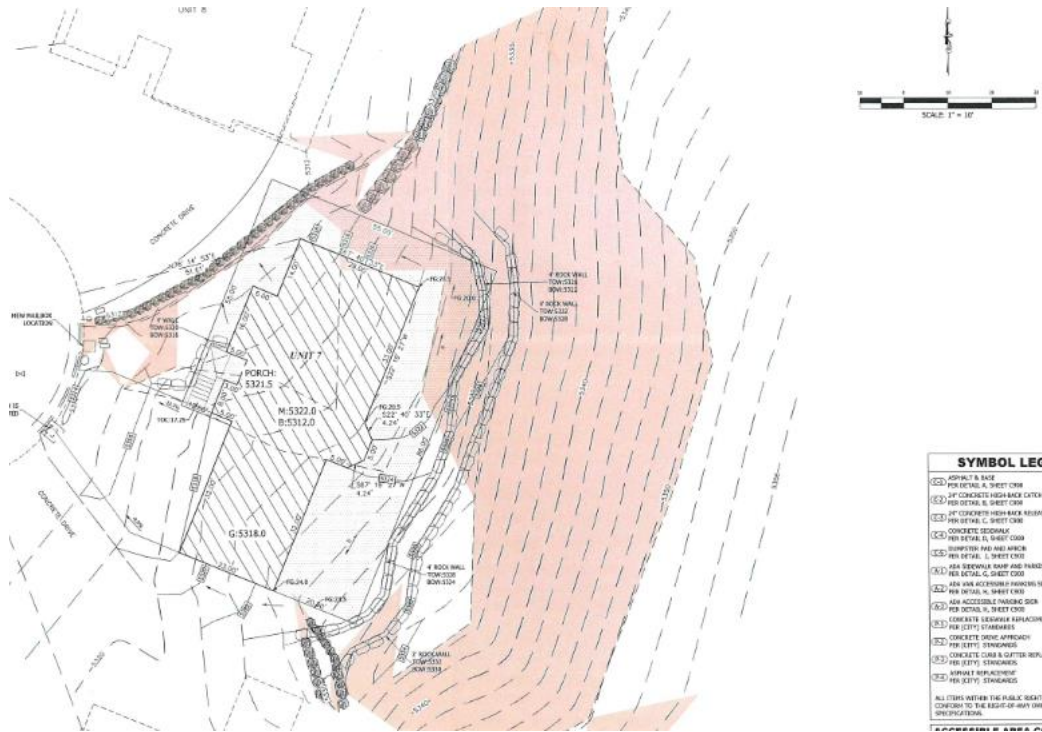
Unit 7 Original Site Plan Shaded are indicates slopes >30%
